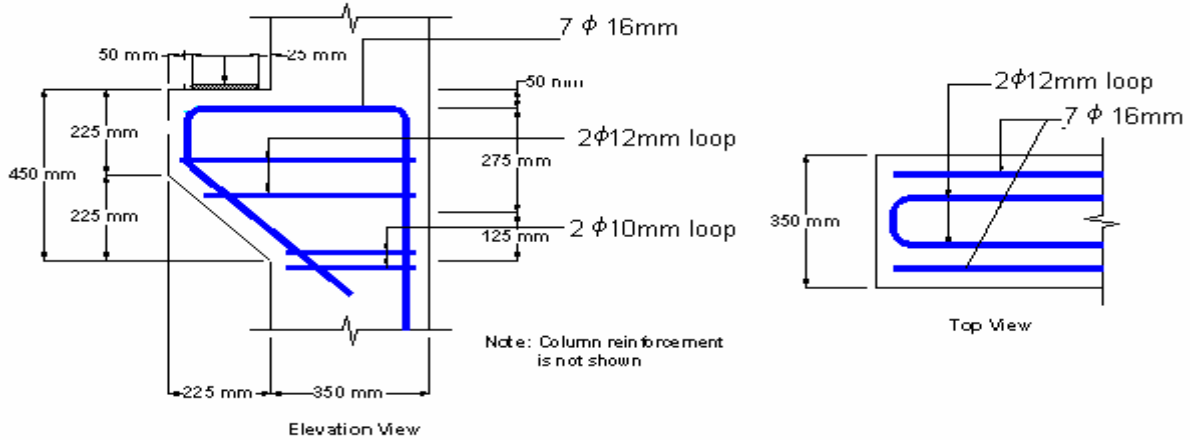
Corbel with the width of the struts and tie reinforcement layout.
